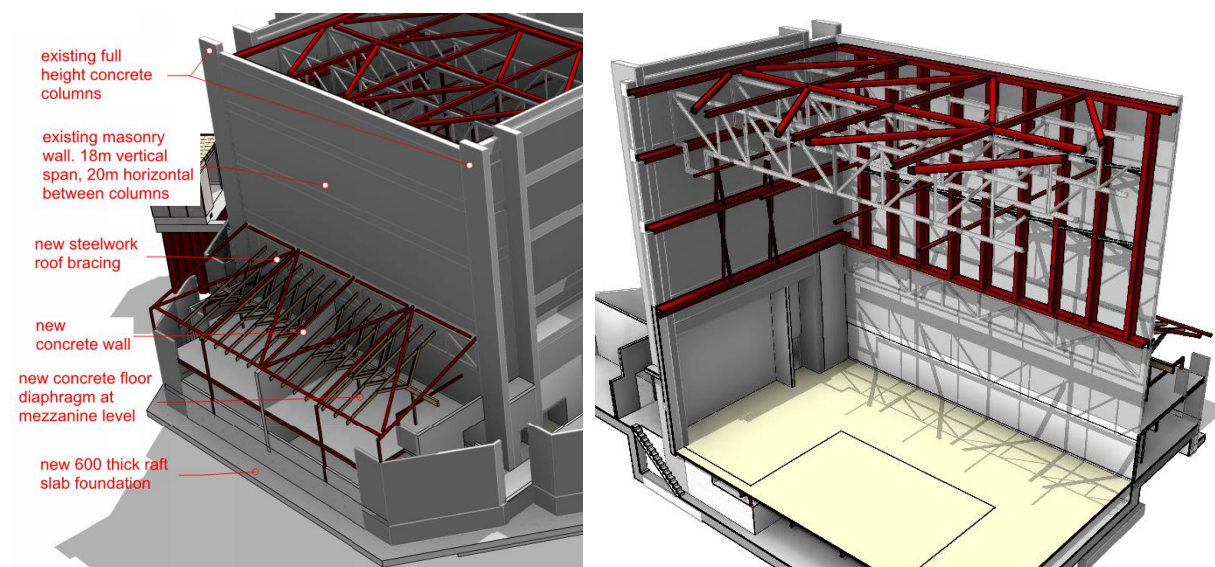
3D Revit perspective views of James Hay Theatre fly-tower. Left: south-west facing the back of house; Right: North-east facing, inside the fly-tower. (Note dark grey elements show existing concrete and masonry).
